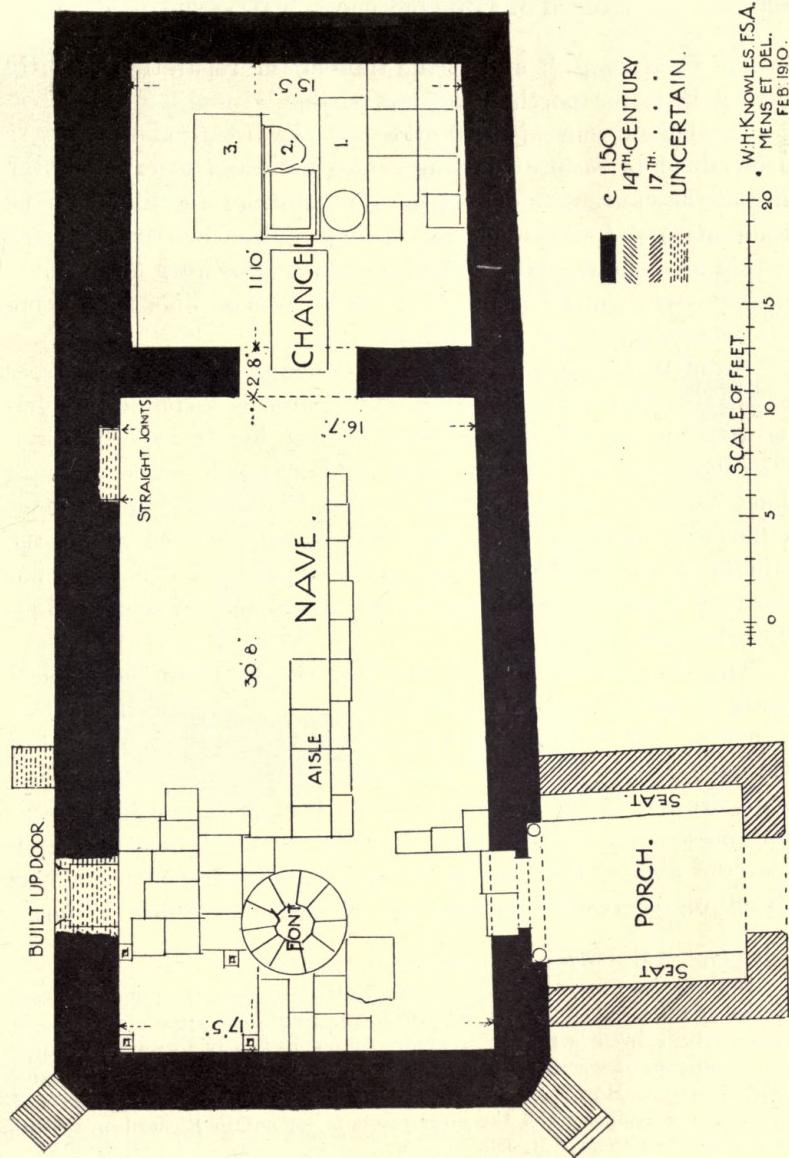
PLAN OF HOLY CROSS CHURCH, WALLSEND.
